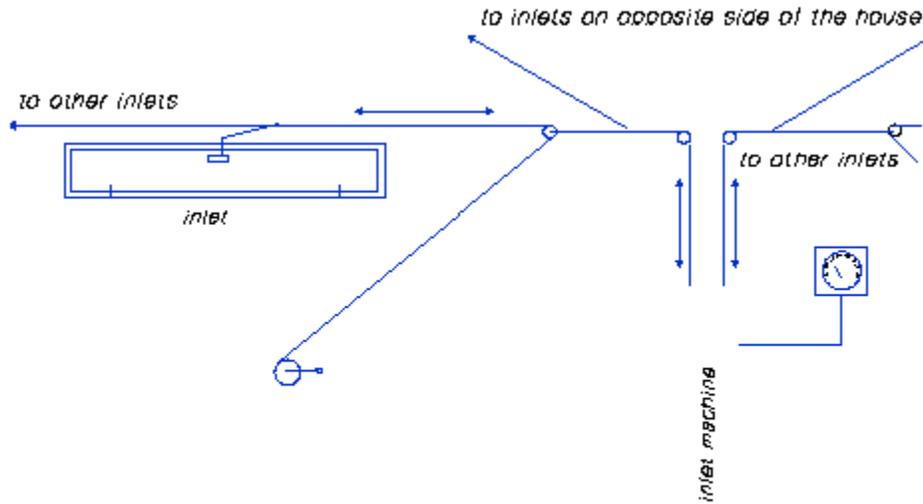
Hand Winch Installation to Increase Inlet Speed in Long Houses.
